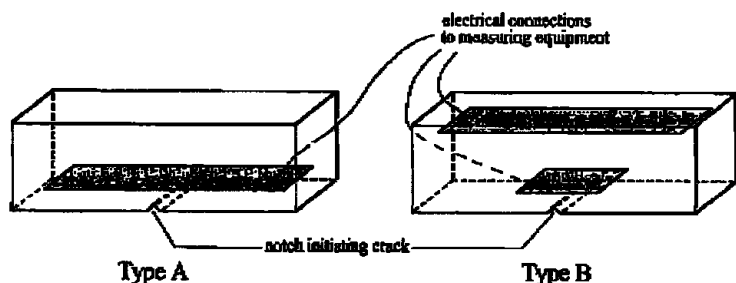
Prismatic concrete specimens reinforced by one (Type A) or two (Type B) steel plates
